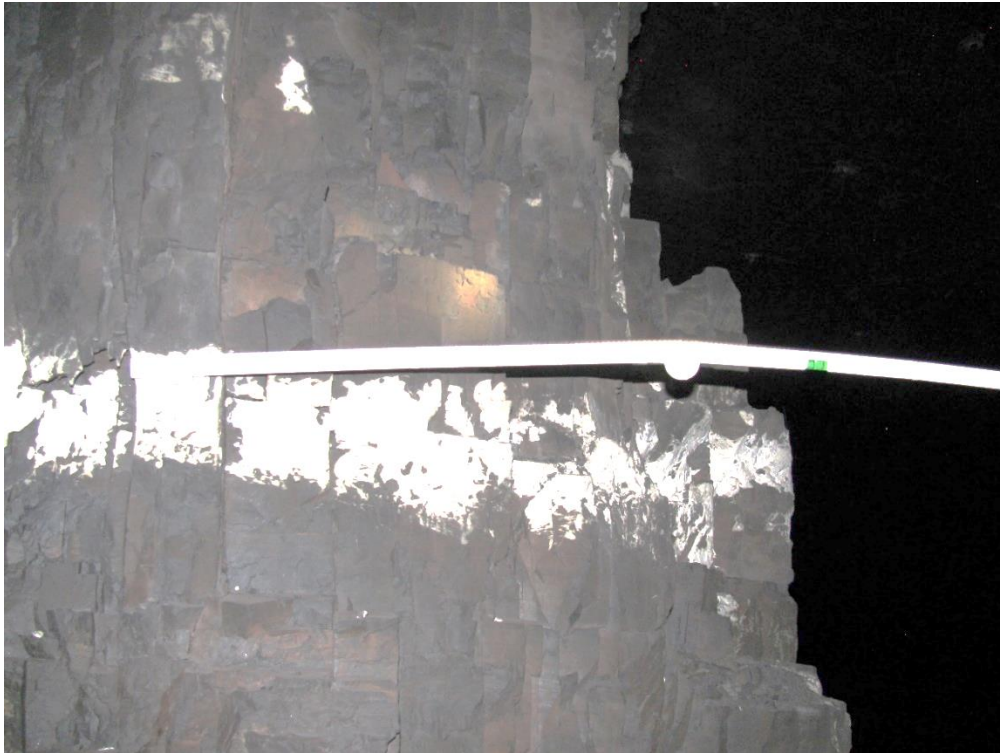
Side A of pillar N3_25 at Nchwaning III shaft, illustrating the vertical joint spacing of the right-hand corner of the pillar.
